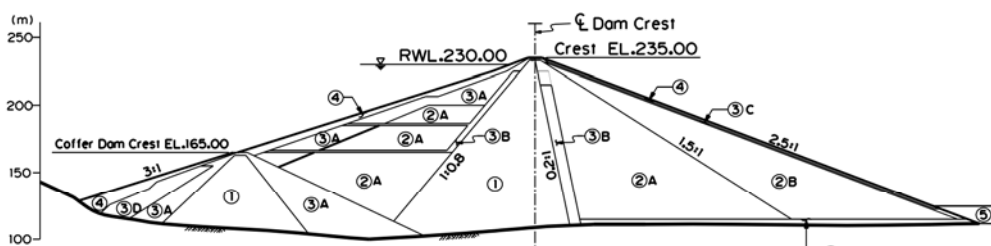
Cross section and zoned materials of Tsengwen embankment
